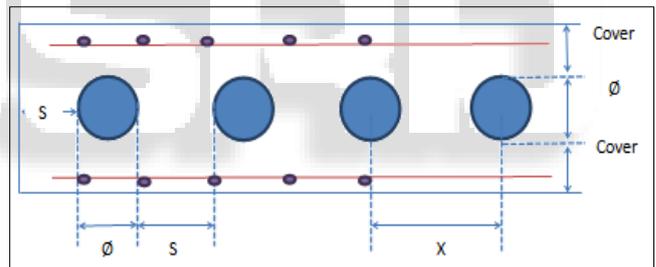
Typical cross section of slab with top and bottom reinforcement
